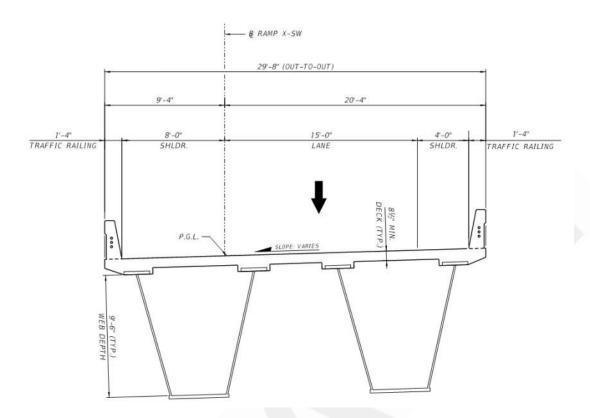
Bridge Typical Section (Bridge No. 2)
